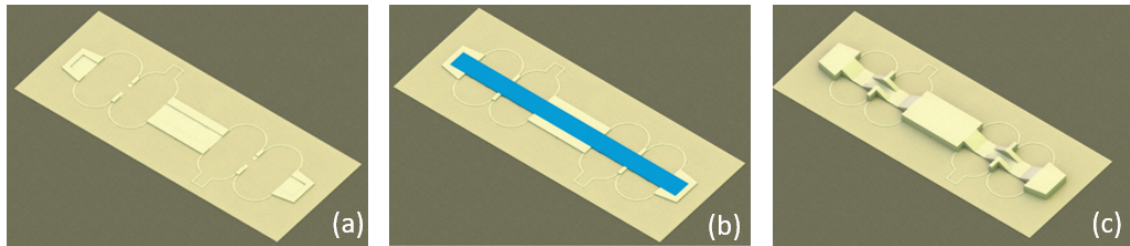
Schematic of the filament welding fabrication of the crawling robot. (a): 3d print the first layer, thermal weld the pouch actuators and bond the 3d printed material with heat pressed TPU base. (b): Pause right after finishing the first layer and attach the support layer over the pouches with adhesive. (c): Resume printing and finish top part of the model.
